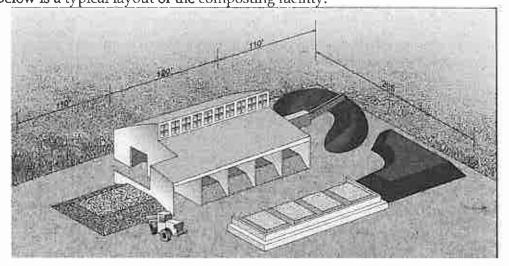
EXAMPLE COMPOSTING FACILITY LAYOUT
